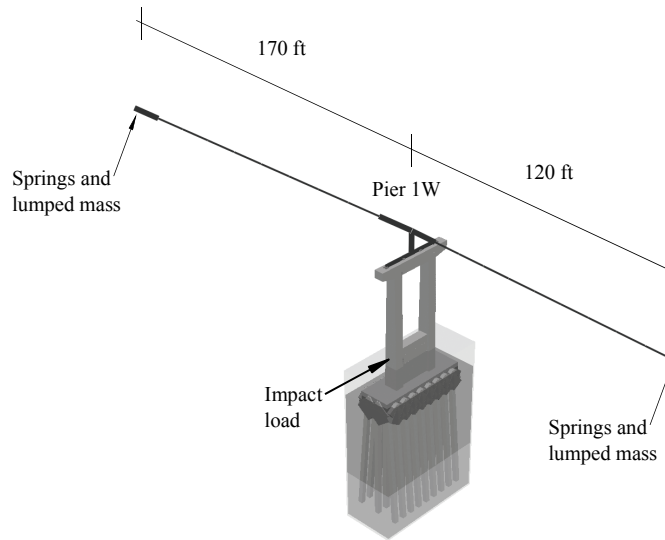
Escambia Bay Bridge, Pier 1W (ESB-CHA) OPTS model
